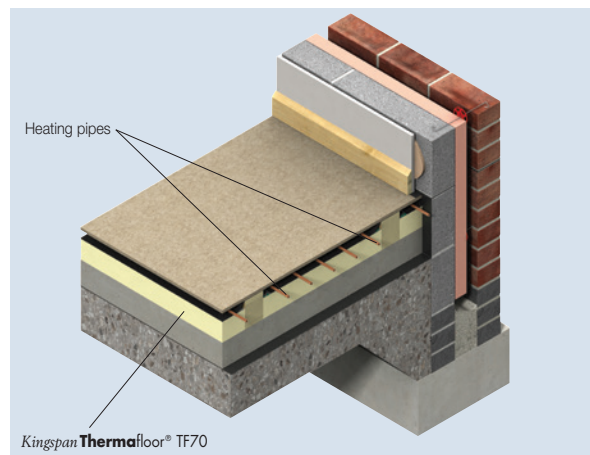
Intermittent Heating Applications – Timber Floor on Battens
